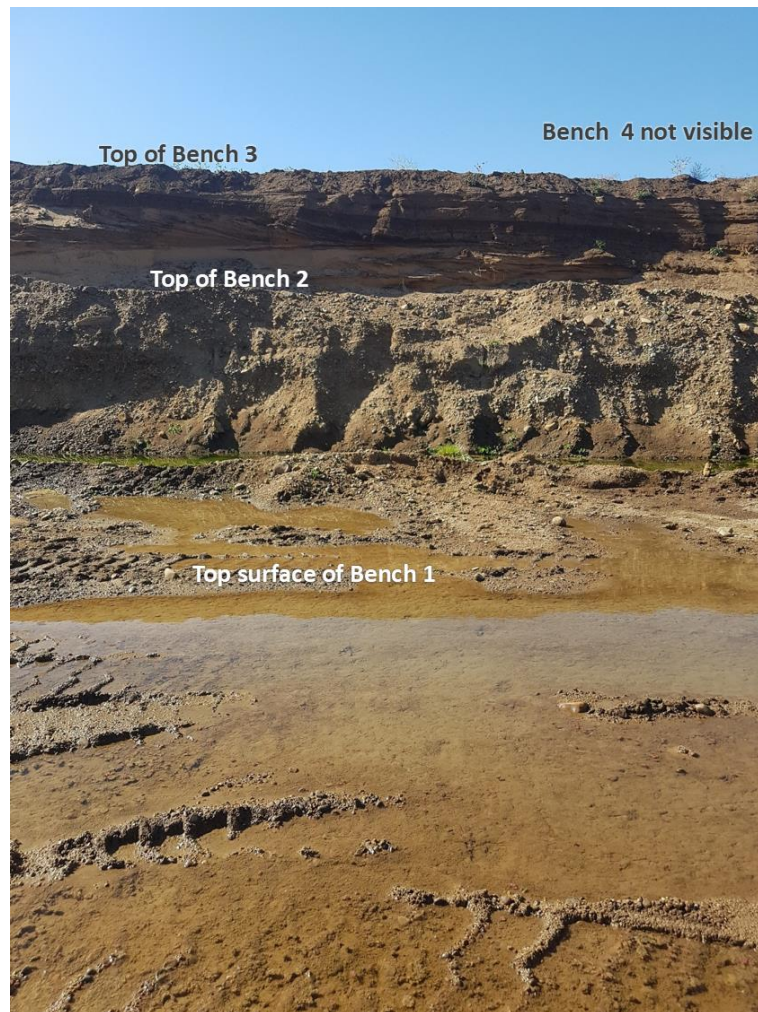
View from Bench 1 – Upper sampling site location towards benches on pit wall where sediment samples were taken in September 2018.
